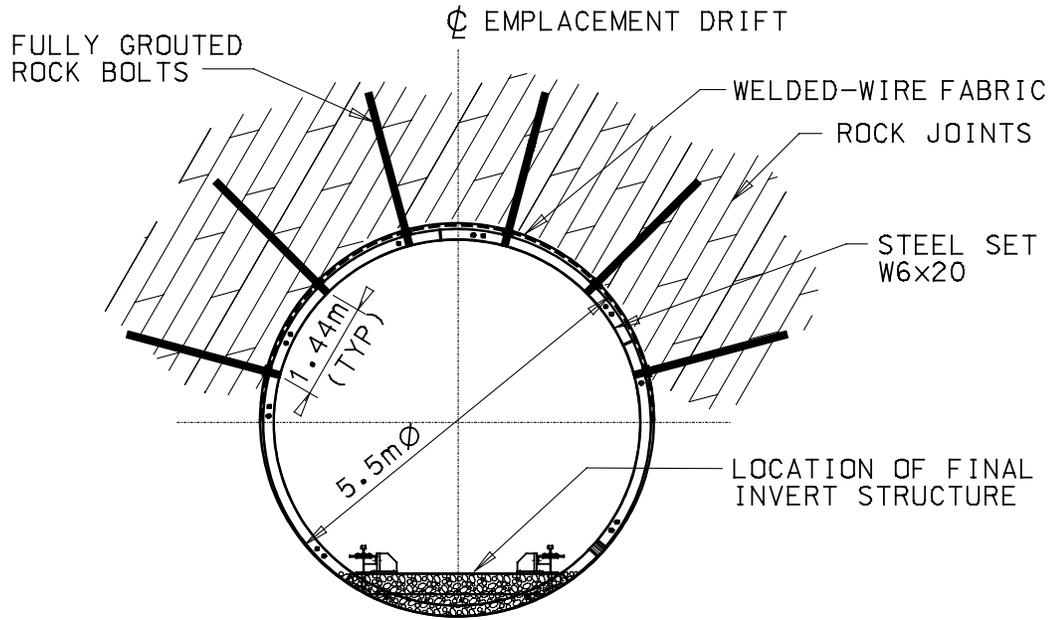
Steel Sets With Welded-Wire Fabric
